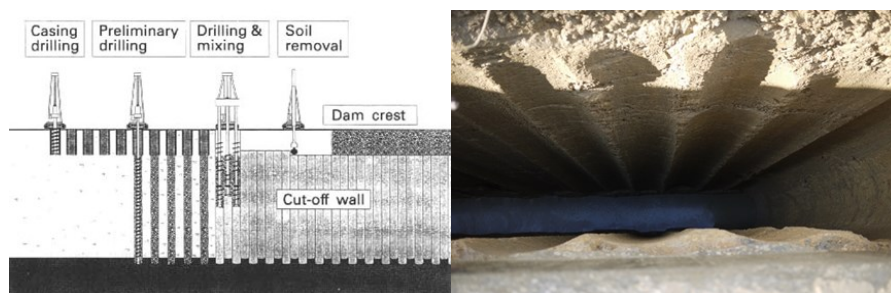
Construction procedure of water cut-off wall (left) and dam crest after *in-situ* churning with grout (right)
